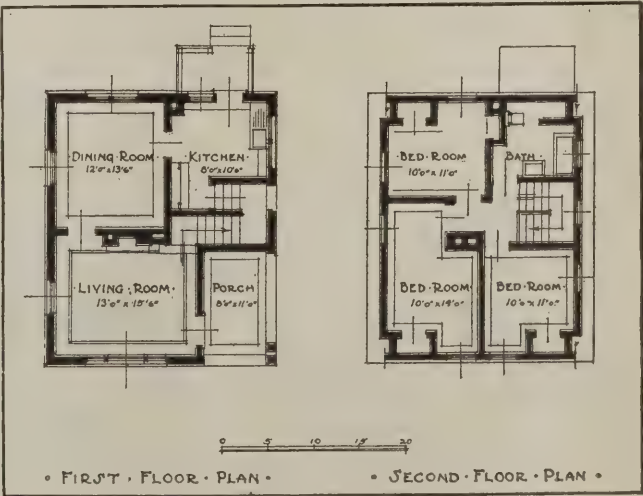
Floor plan of the concrete and frame dwelling shown in Fig. 3. The rooms on the main floor are a little larger than in the preceding plan, and an additional bedroom is provided
